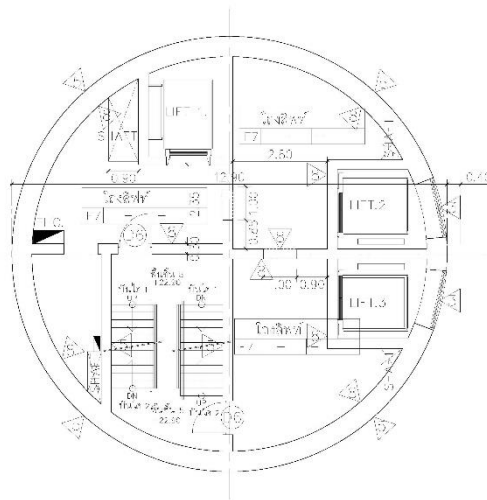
Floor plan of the building from the 6th to the 22nd floor.
